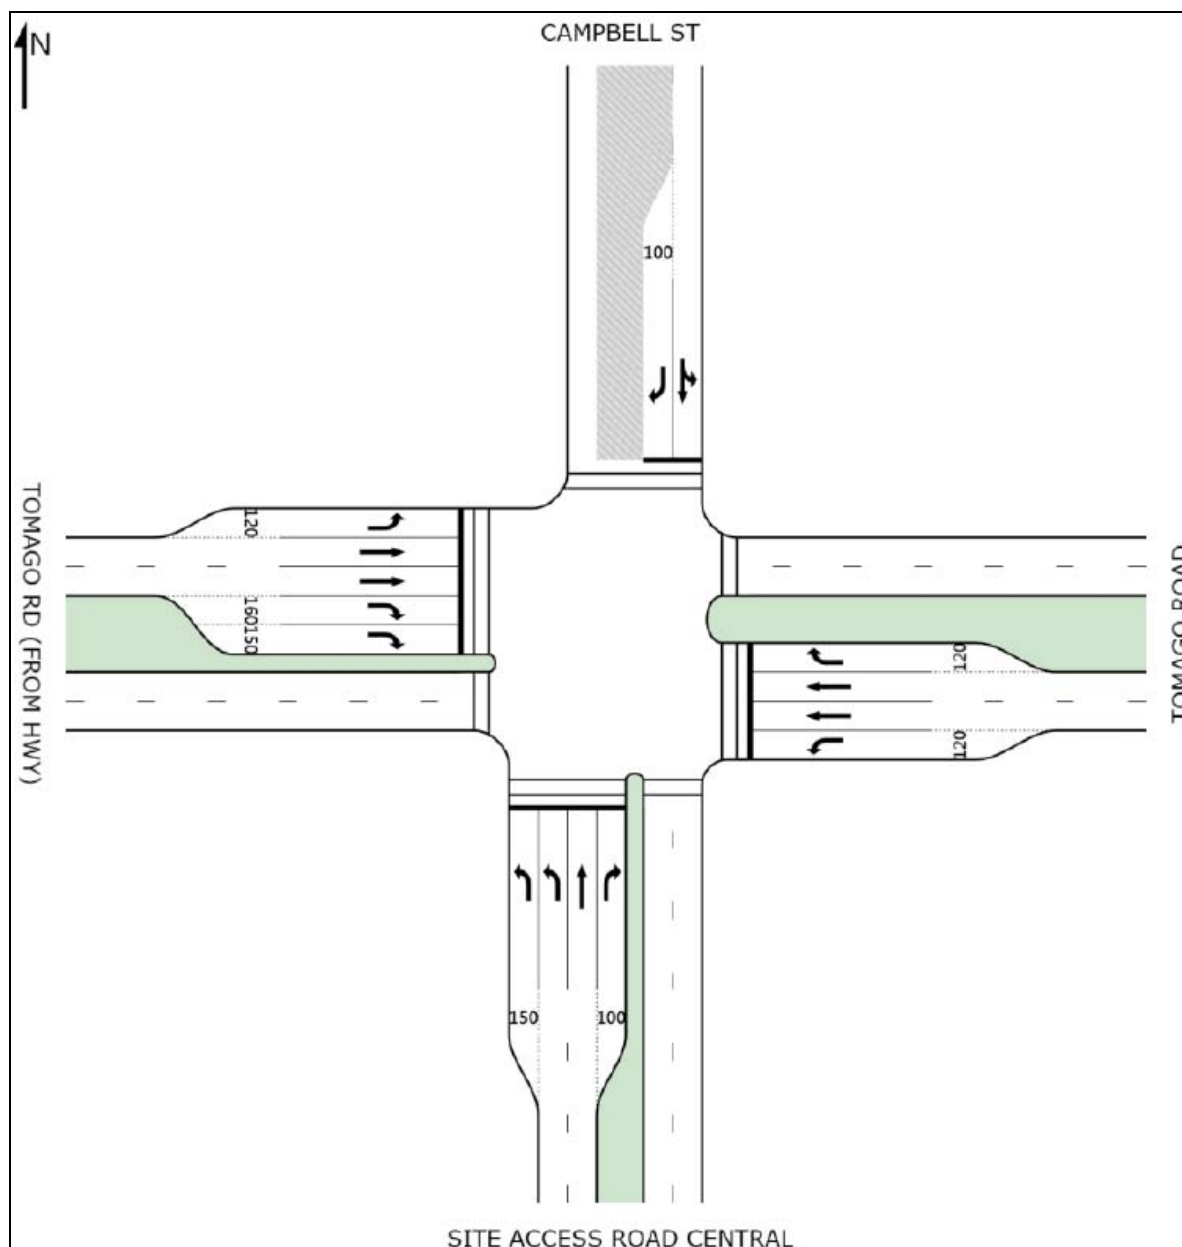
SIDRA Geometric Layout, Central Intersection.
